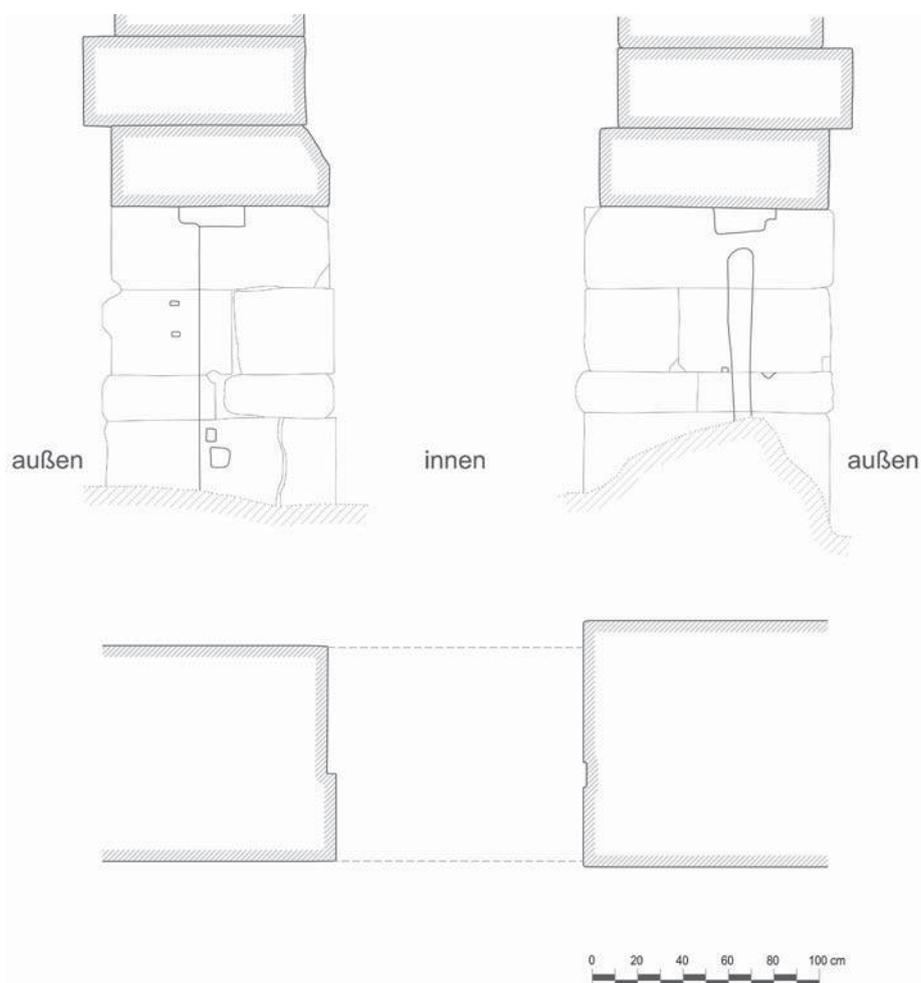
Pednelissos, Opening F. West Tower, ground floor, wall on the city side, door: vertical sections and horizontal section
